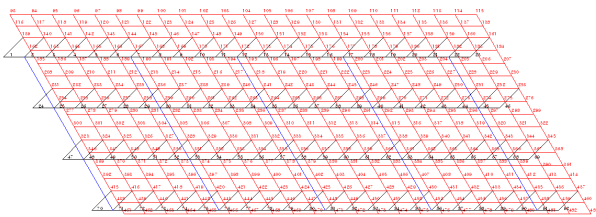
Example of steel plate girder bridge Modeling (span=20m)
